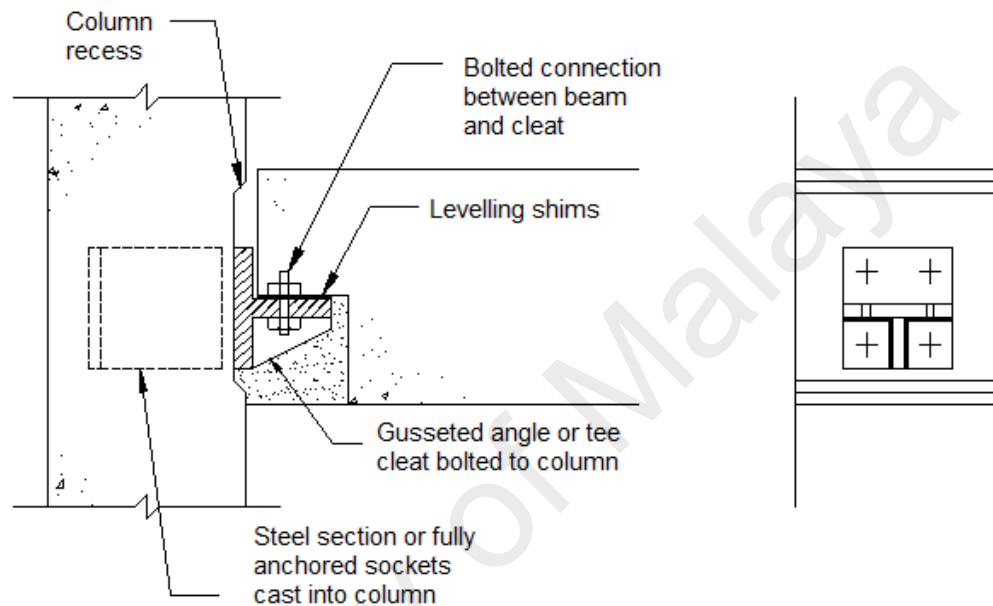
Precast beam to column connection using rolled H-section and bolted on cleat (Elliott, 1996)
